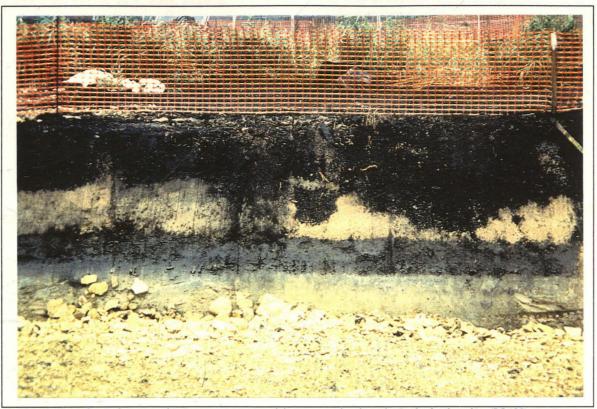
View of typical stratigraphic sequence encountered during groundworks to the south of railway line (ROA95)
